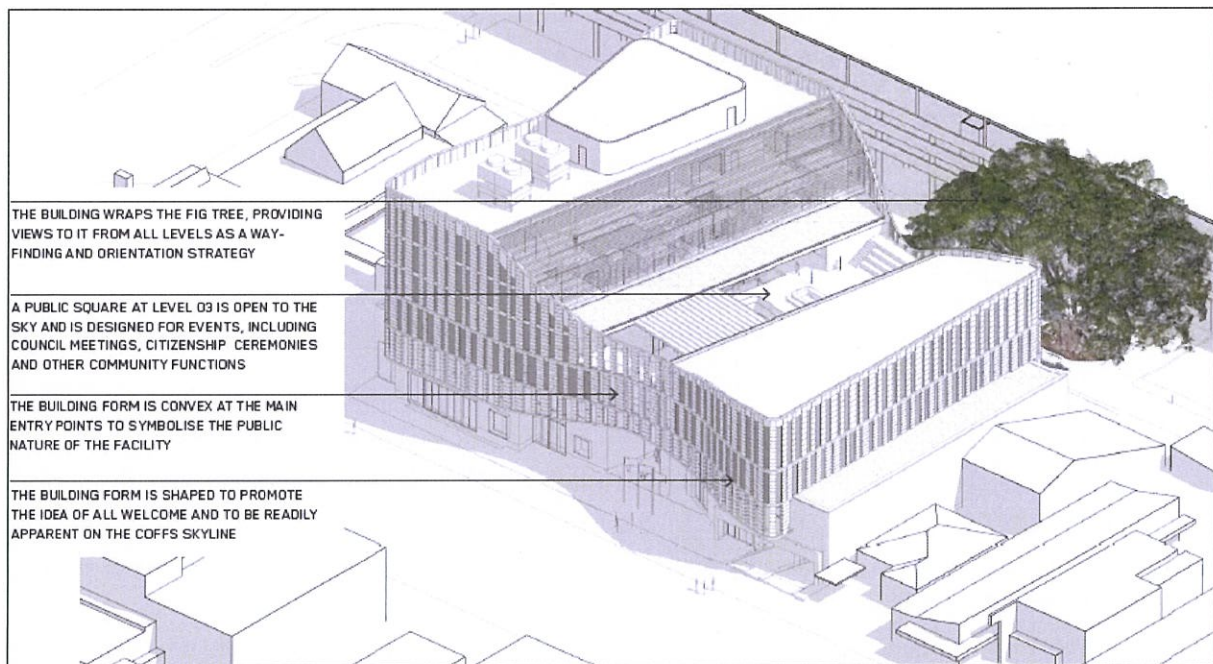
| Key design elements of the building (source: Applicant's Design Report)
